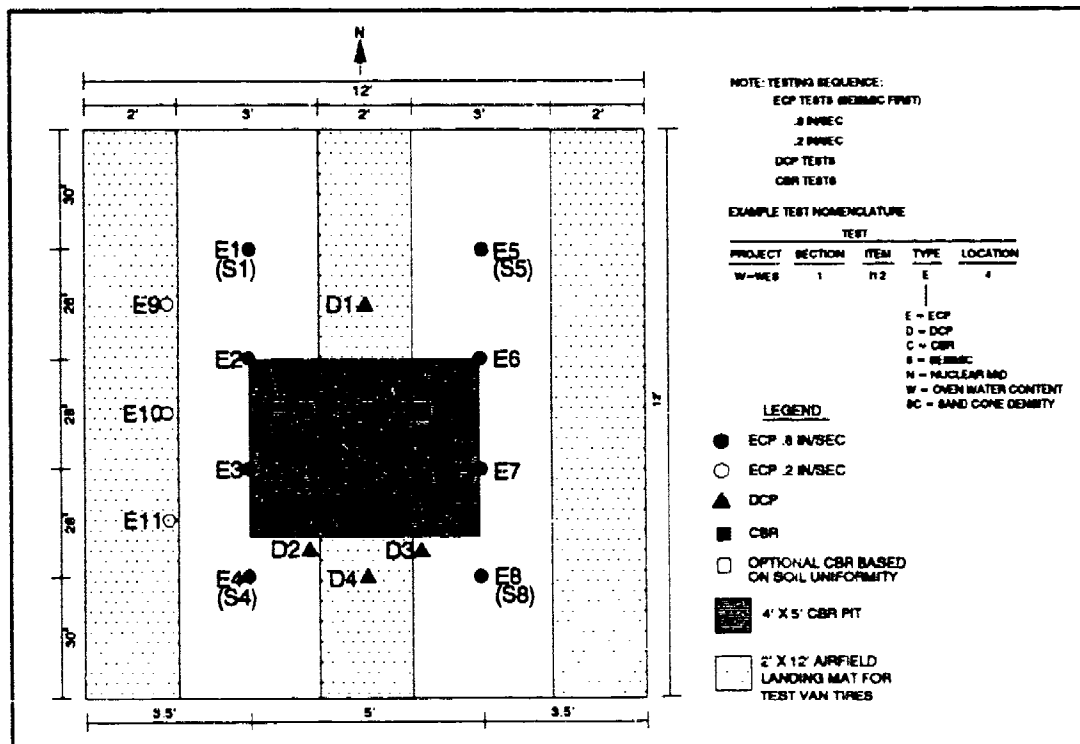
Test layout for typical test item for test sections 2, 3, and 4
